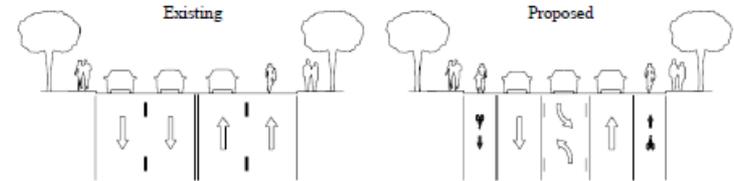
Balcones Drive and Parkcrest Drive Proposed Typical Cross Section
